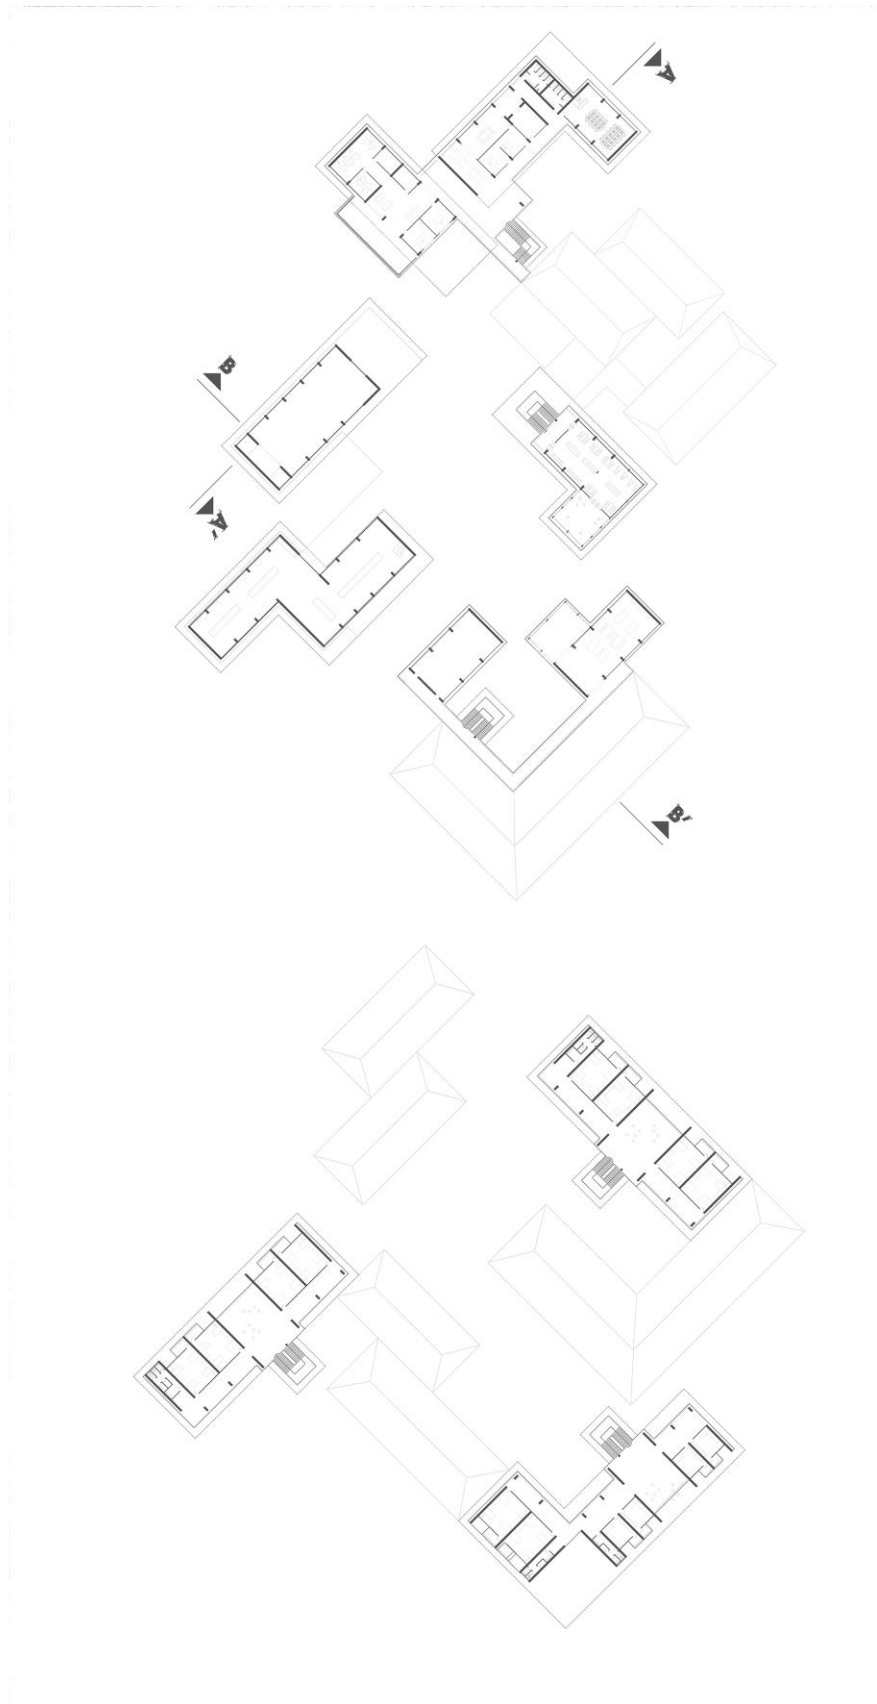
Upper floor plan; Source: Aneeka Habib, 2016
